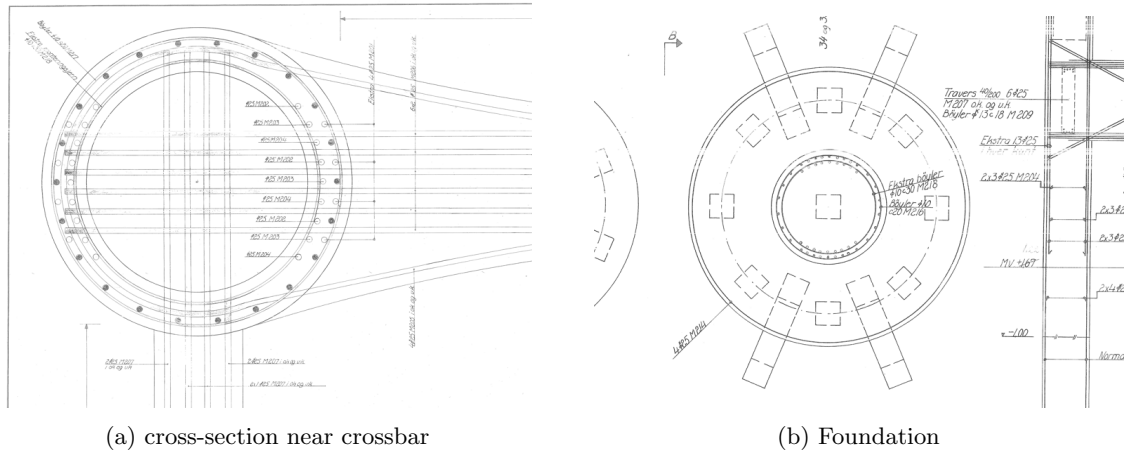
cross-section of columns 33-37 at crossbar and foundation
